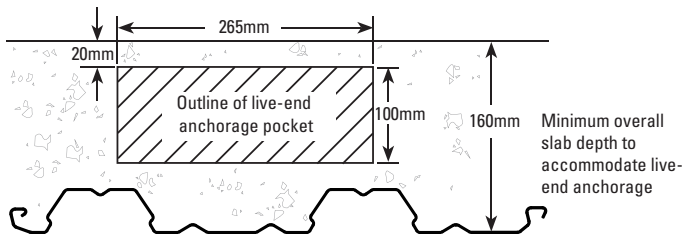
Fitting a Typical Live-End Anchorage in a Composite Slab Incorporating KF40[®]
